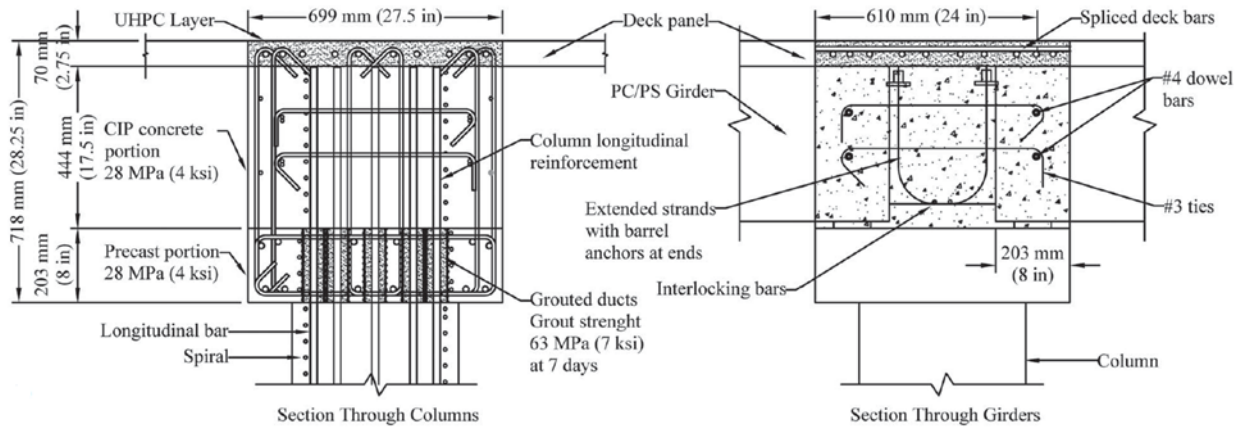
Detail for column-to-cap beam and superstructure-to-cap beam connections from Benjumea et al. [113]
